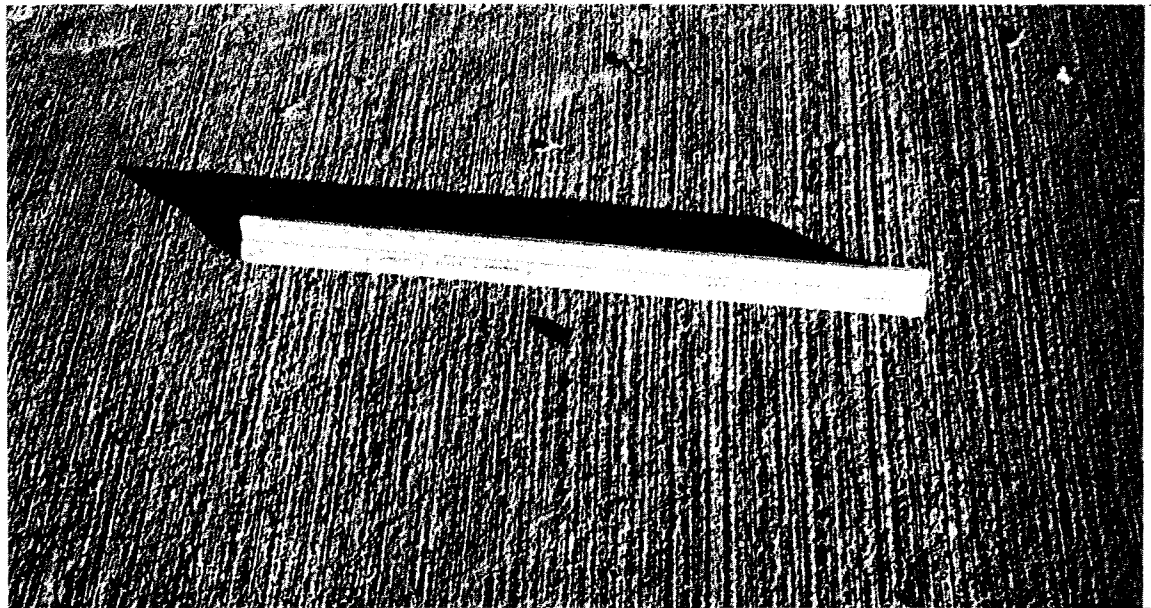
Test Section F-20: Transverse Brush Finish (As Constructed)
